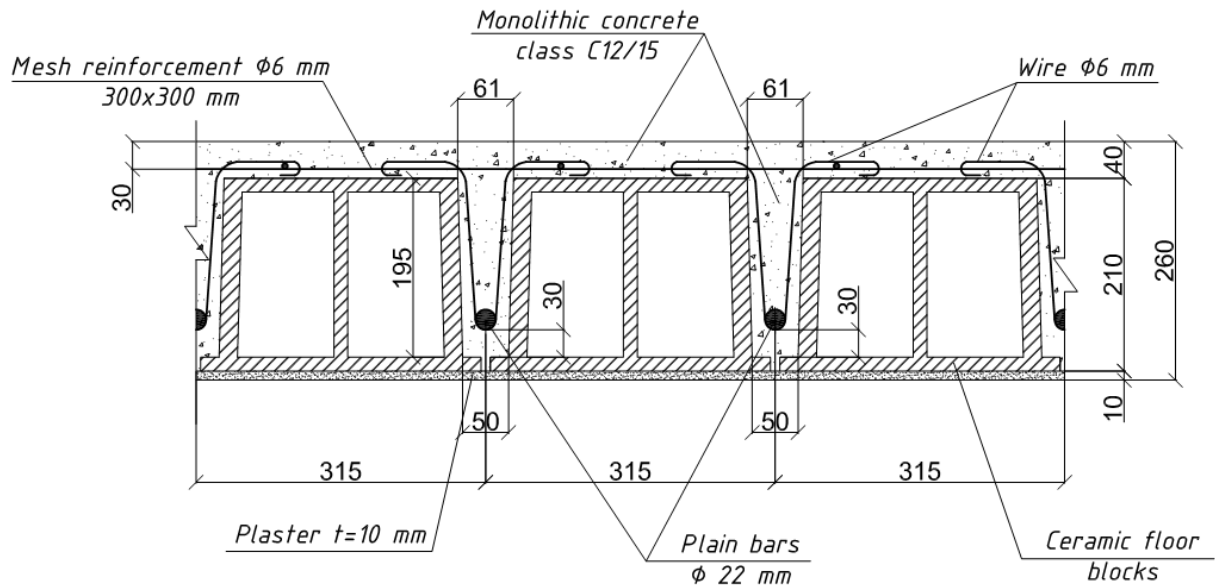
Area “3” Construction of hollow block floor on the first floor
